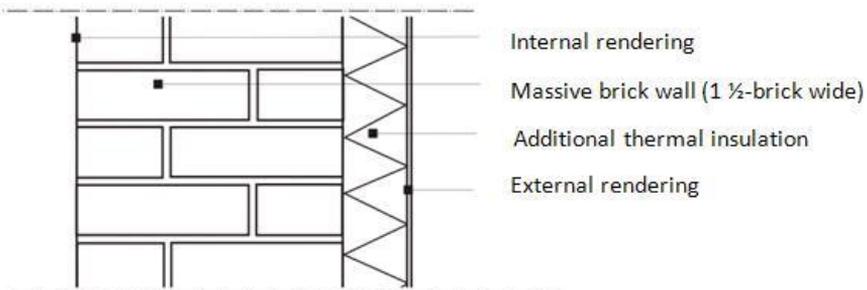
1½ brick thick massive brick walls. Original structure and renovation with additional thermal insulation.
